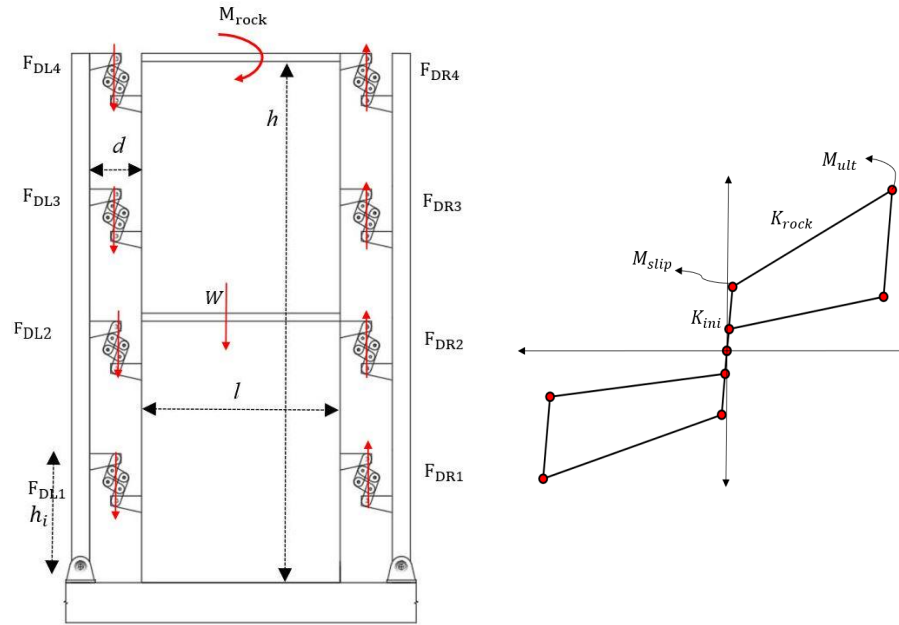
a) Schematic of single wall system; b) general hysteretic response of rocking wall with R-RSF joints
